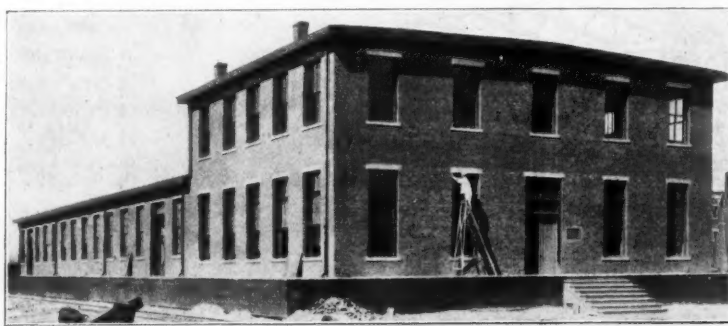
STOREHOUSE AND OFFICE BUILDING—EL PASO & SOUTHWESTERN RY.
